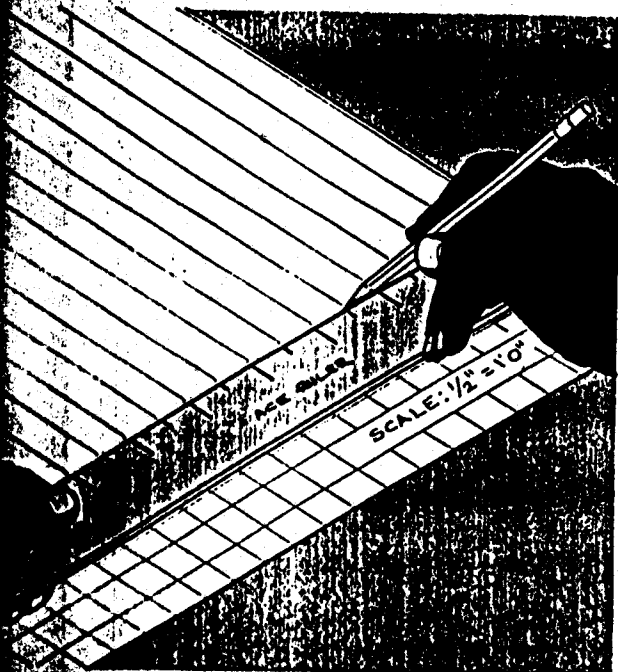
Mark your plan sheet into 1/2 inch squares.
